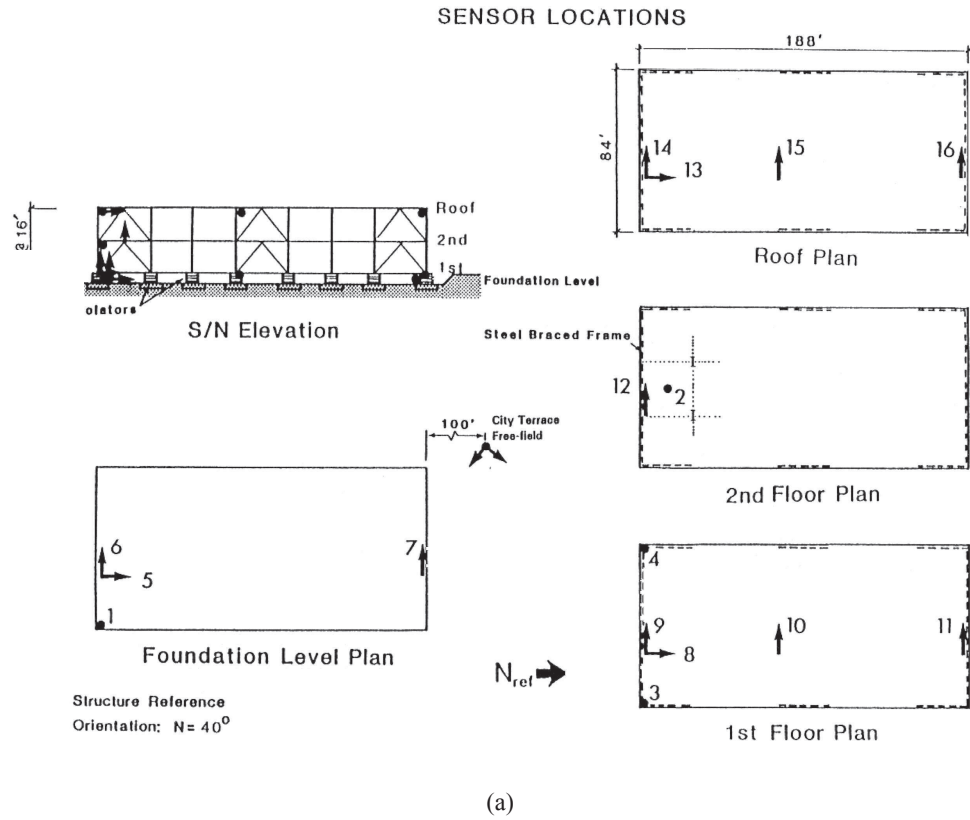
FCC Building (a) Elevation, Plan, and Sensor Locations, (b) Analytical Model, and (c) Entry Bridge and Isolation Gap.
